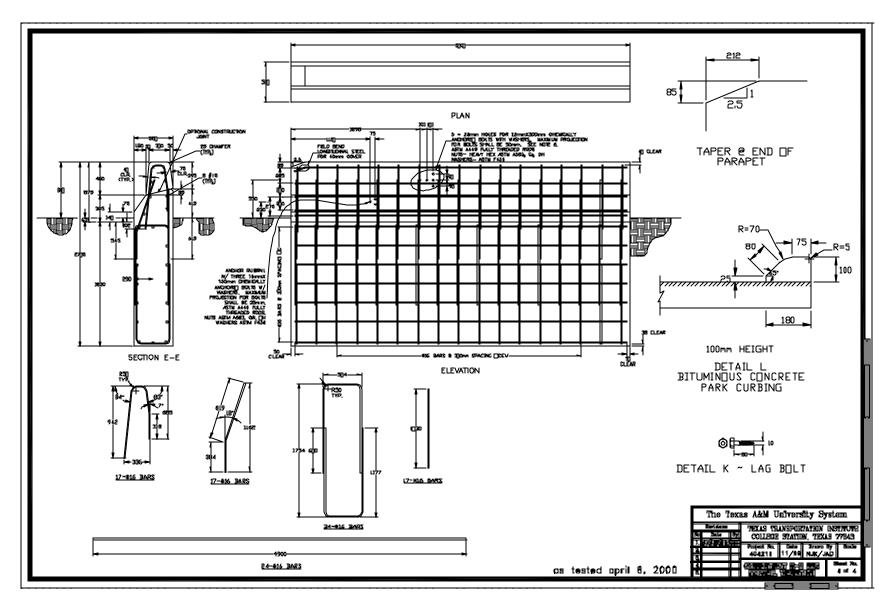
Details of the Connecticut transition installation for test 404211-9 (continued).
